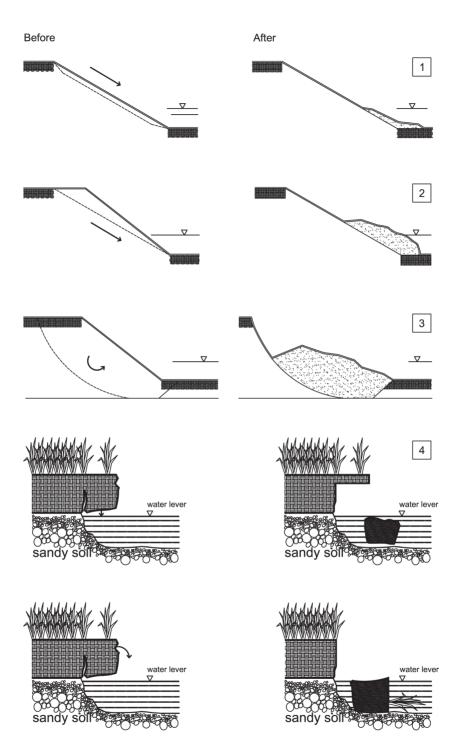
Types of failure of embankment, before and after of failure. From top to below: shallow failure [1], planar failure [2], rotation failure [3] and failure in composite banks [4]
